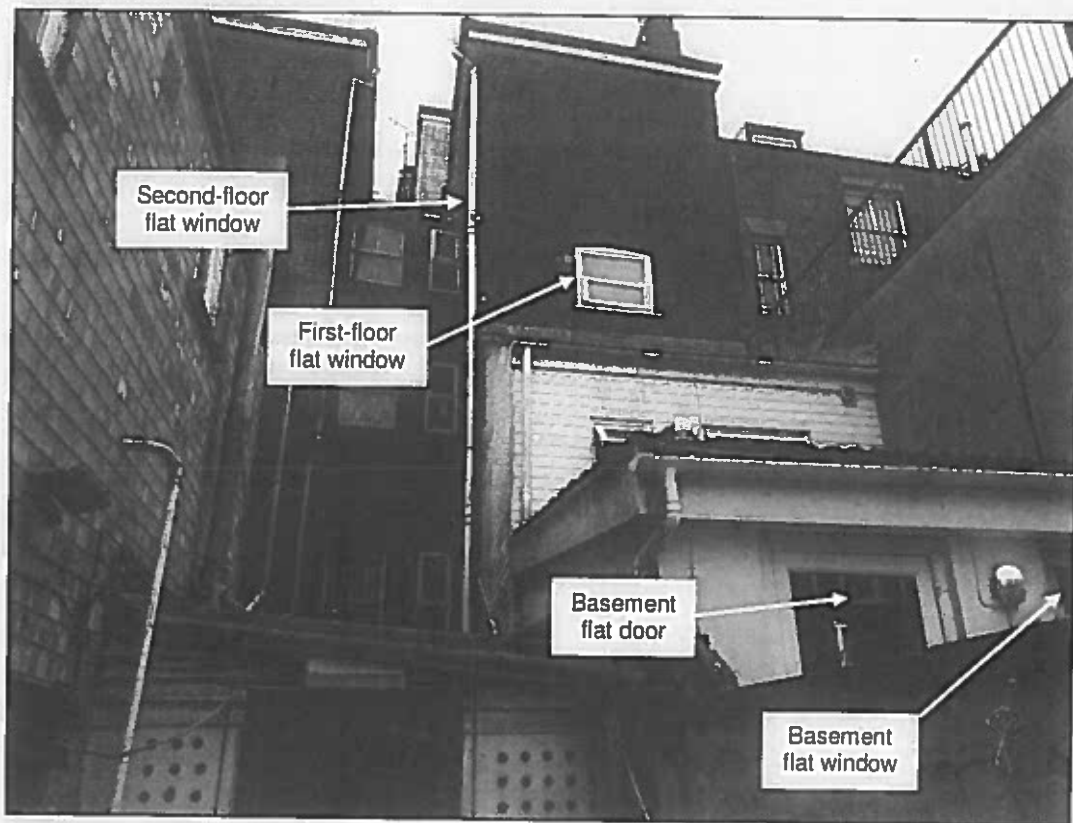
Photo of rear of 72 & 70 Prince of Wales Road
